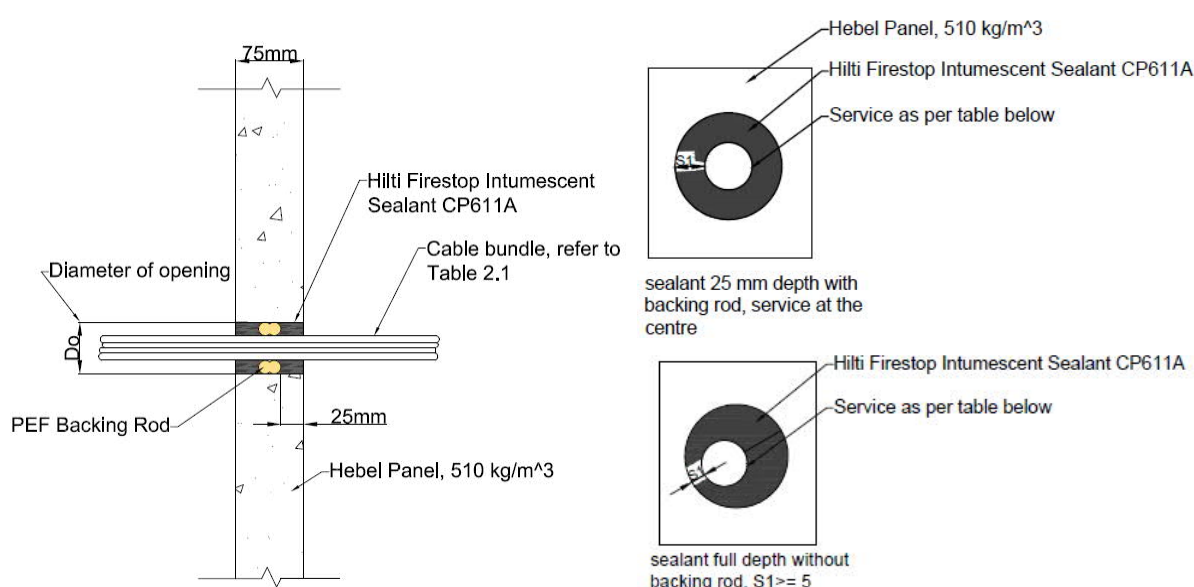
Side View- Cable Bundle with PEF backing rod
